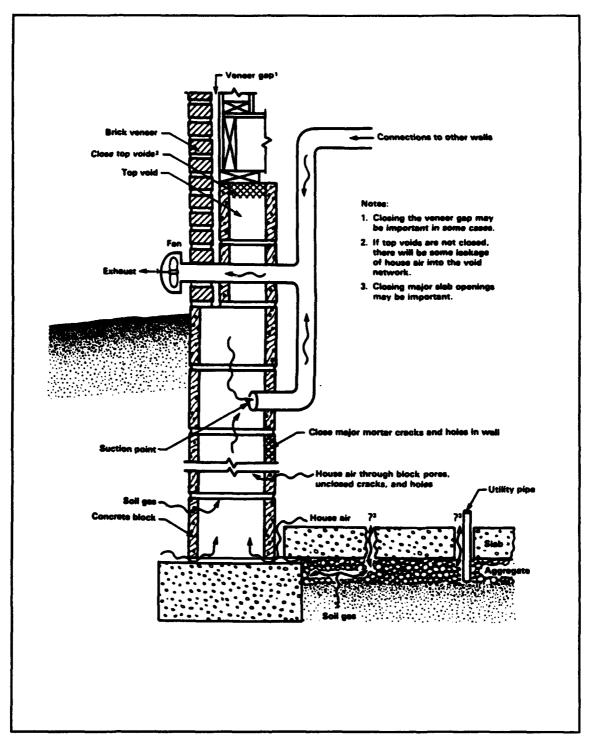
Wall Ventilation with Individual Suction Points in each Wall (Source: EPA 1986, p.23)
